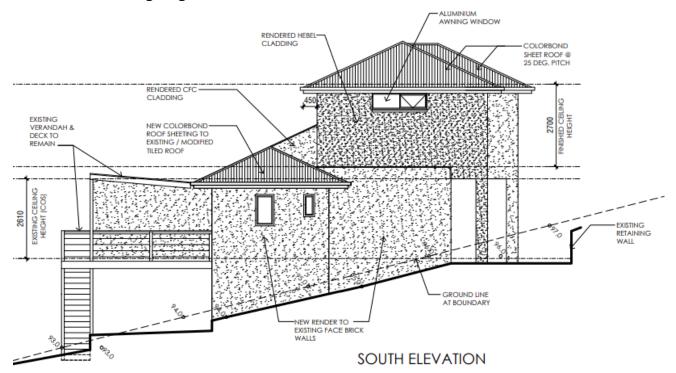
showing the southern elevation of 102 Davenport Terrace to the north of the subject site.
